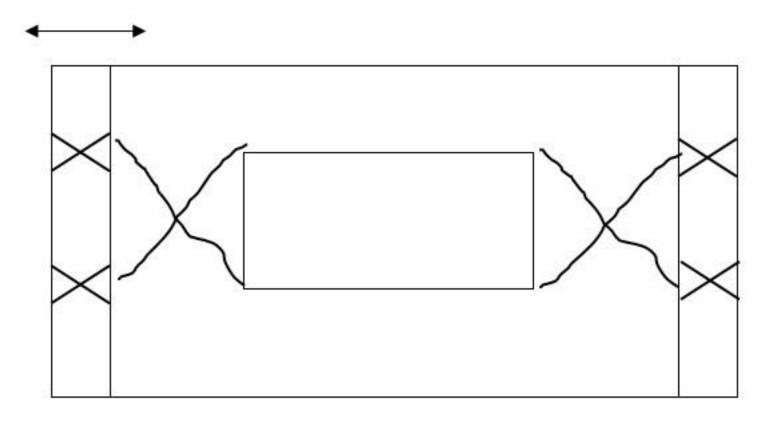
150 mm RC Masonry Infilled Frame (With Openings) Failure Mode: Masonry diagonal cracking and RC columns shear failure Cause of Masonry Failure: Inadequate horizontal reinforcement; poor unit, joint mortar, or grout compressive strength; possibly excessive vertical rebar Cause of RC Columns failure: Inadequate or insufficient transverse rebar legs
